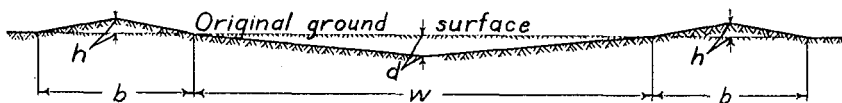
CROSS SECTION OF A TERRACE OUTLET CHANNEL
